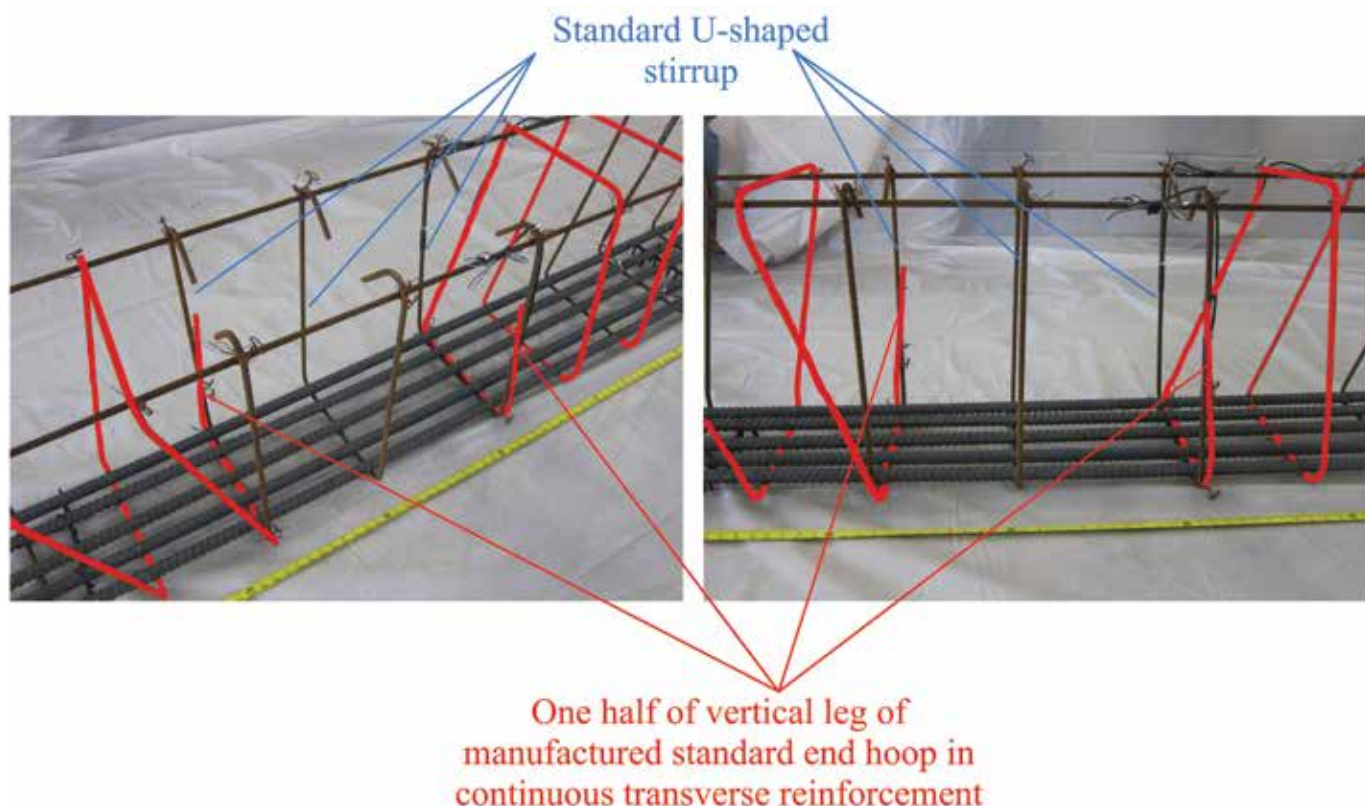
Detail of test configuration for field modification of CTR cage. Because conventional transverse reinforcing can be tied to and replace the cut CTR, the CTR can be terminated at any leg. Additional conventional reinforcement can be added as required to complete the cage
